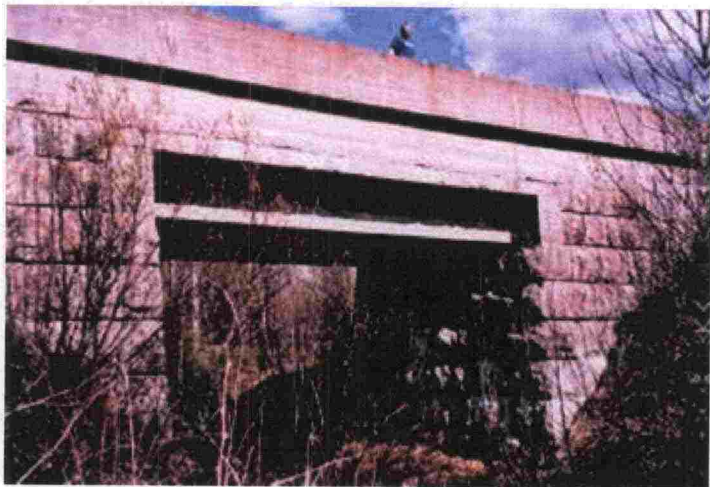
Concrete Girder Bridge, Myllyojan, 923+146 from 1951.
